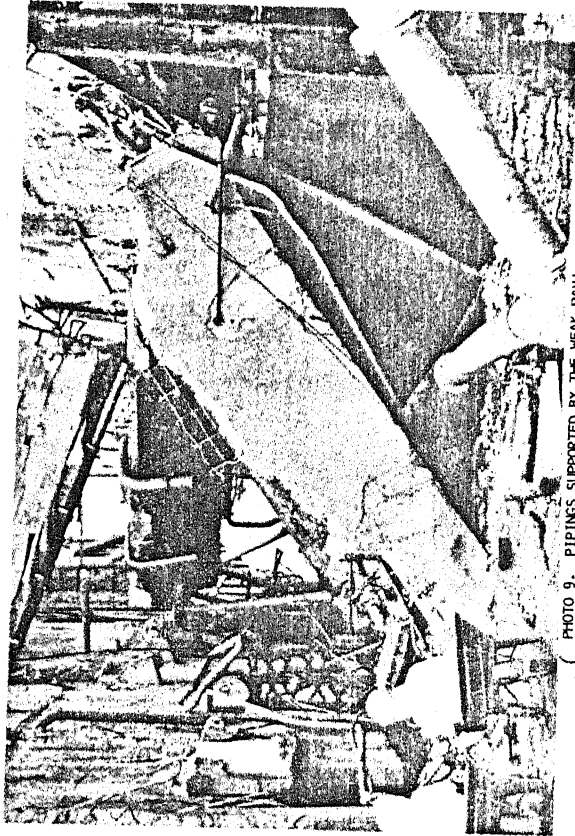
PIPINGS SUPPORTED BY THE WEAK PART OF BUILDINGS WERE CRASHED WITH IT.
